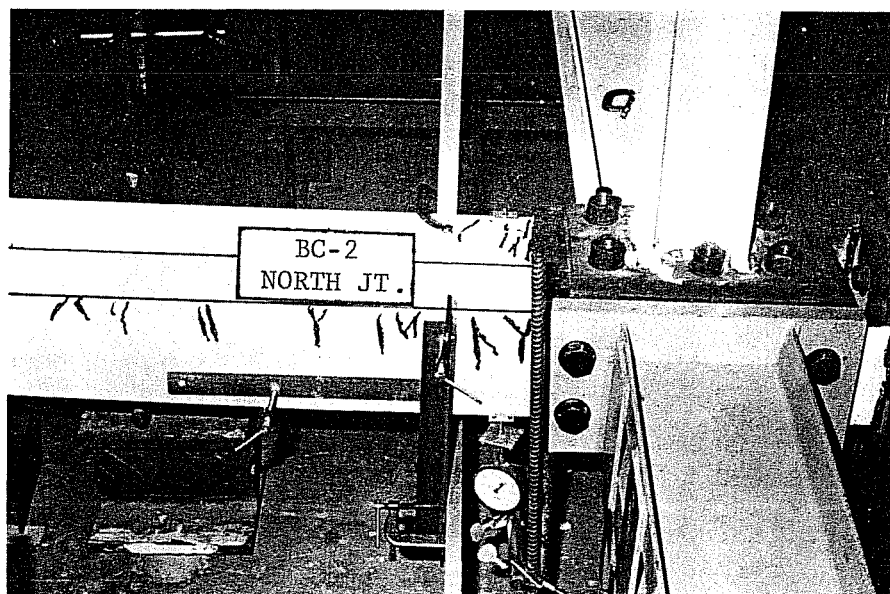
Yielded zone at north joint after failure, Specimen BC-2
